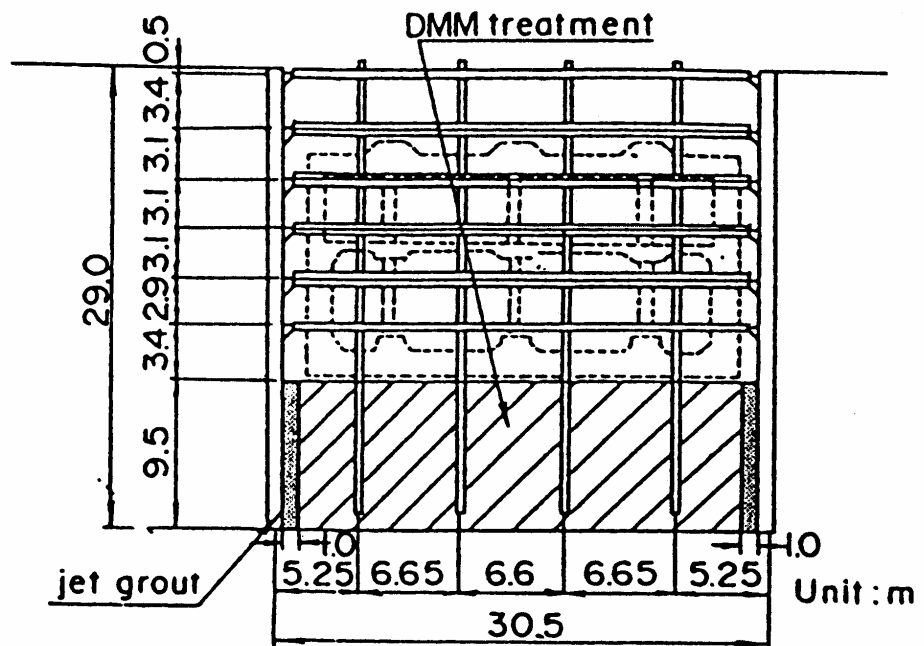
(a) Section of braced excavation with soil improvement work [after Tanaka (1993)]
